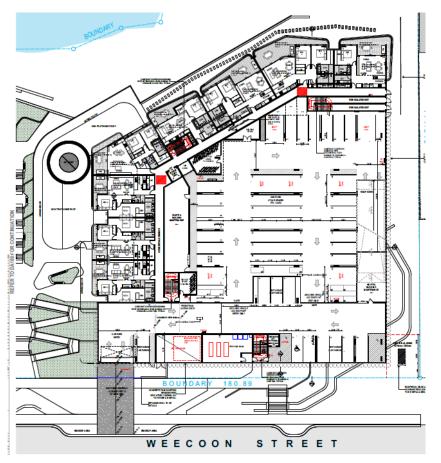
PROPOSED SECOND FLOOR PLAN:
